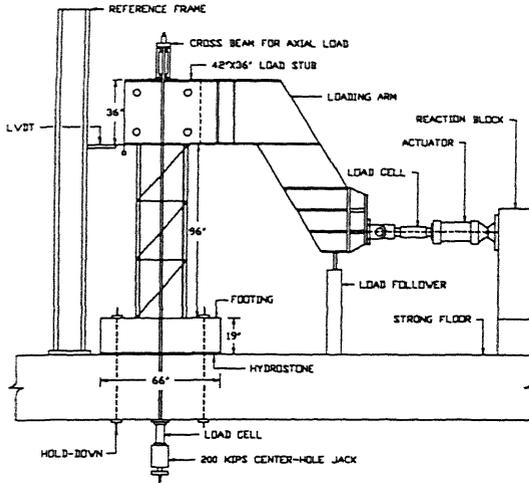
Shear Test Setup (1 in = 25.4 mm)
